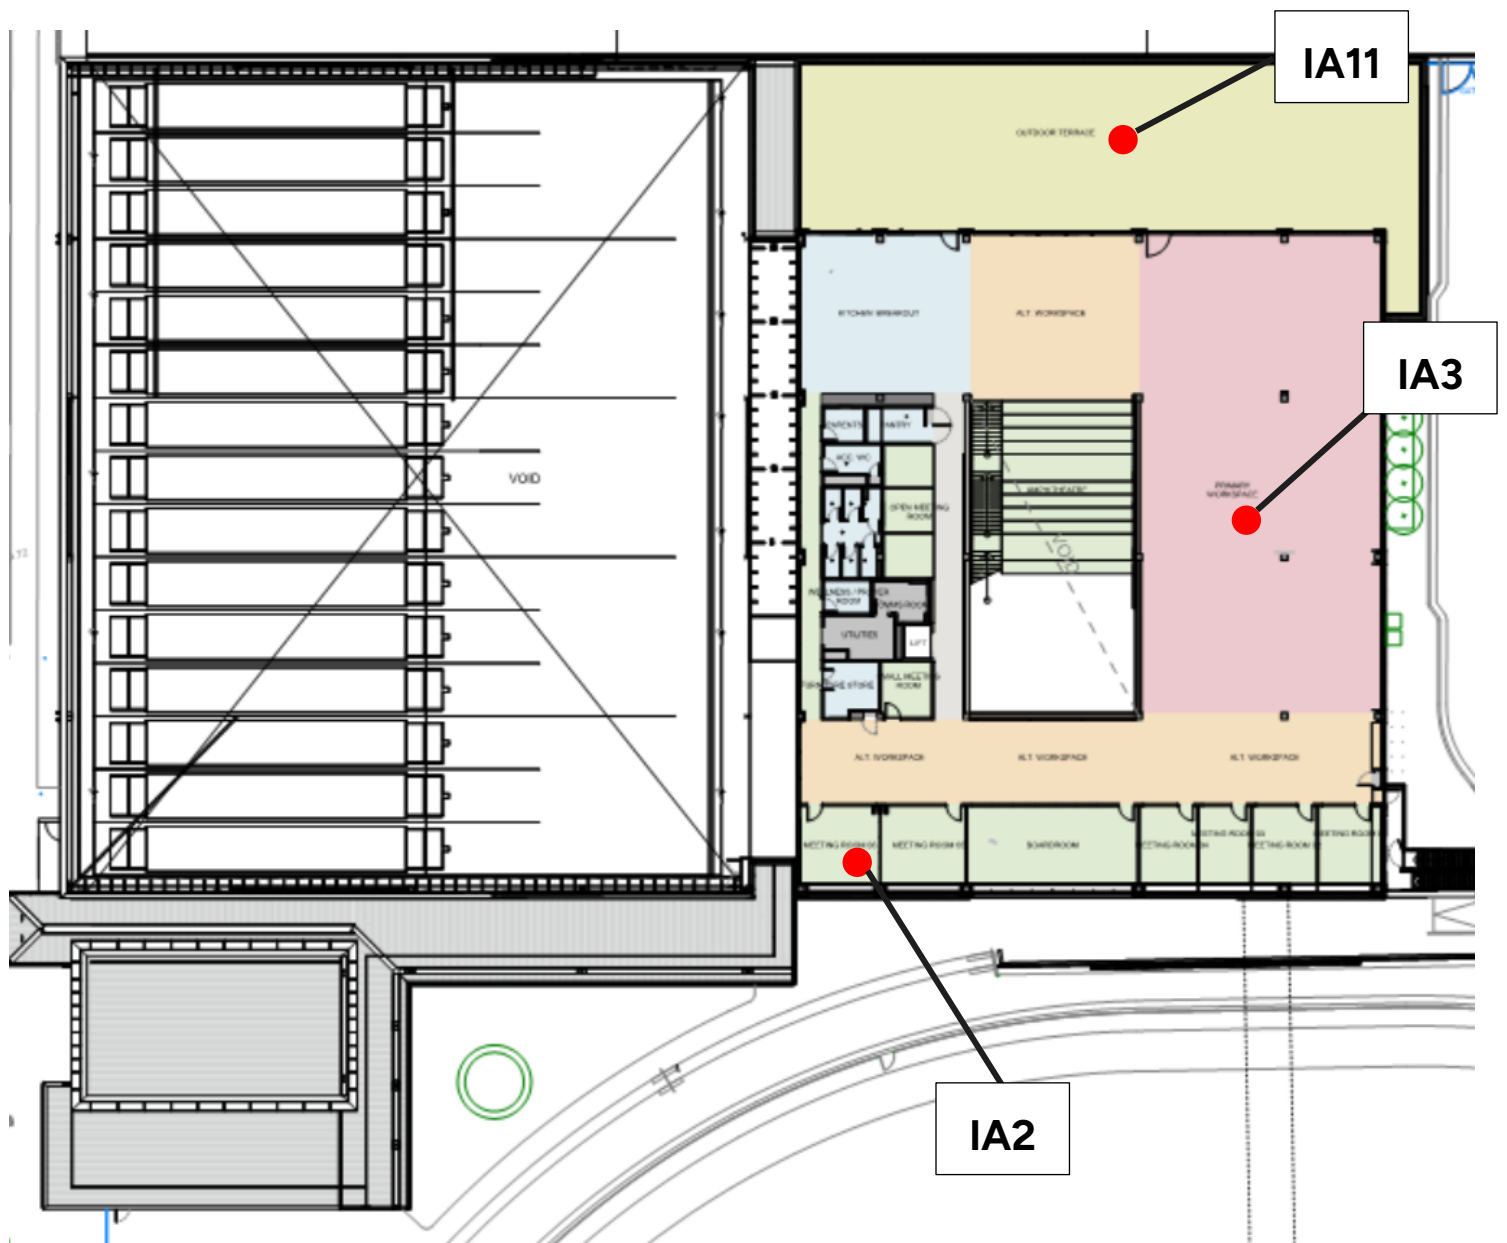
Sample locations to First Floor and Terrace of the Main Building
